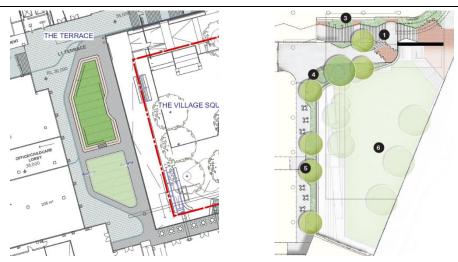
Approved Level 1 terrace (left) and proposed amended Upper Ground terrace (right)
